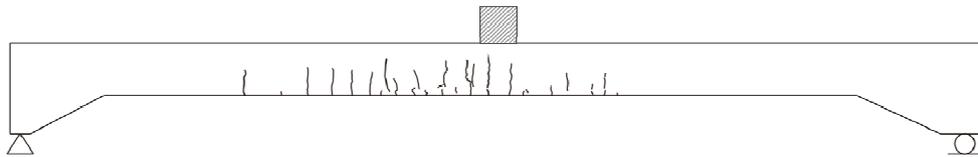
Crack pattern of Seoul Sta. (when test termination)
